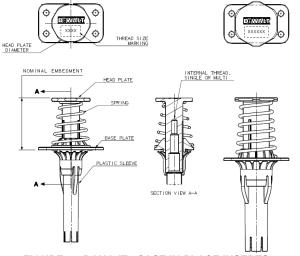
BANG-IT+ CAST-IN-PLACE INSERTS FOR CONCRETE FILLED STEEL DECK FLOOR AND ROOF ASSEMBLIES
